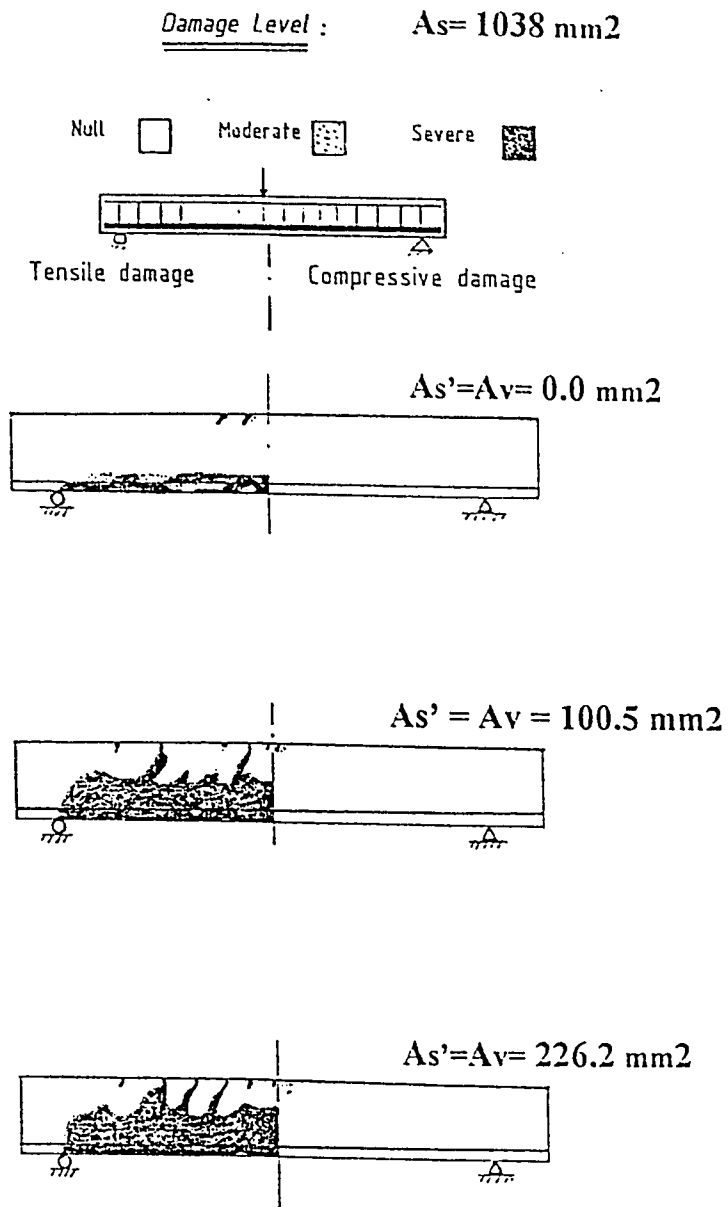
Effect of amount of shear reinforcement on damage pattern for heavily under-reinforced concrete beams
